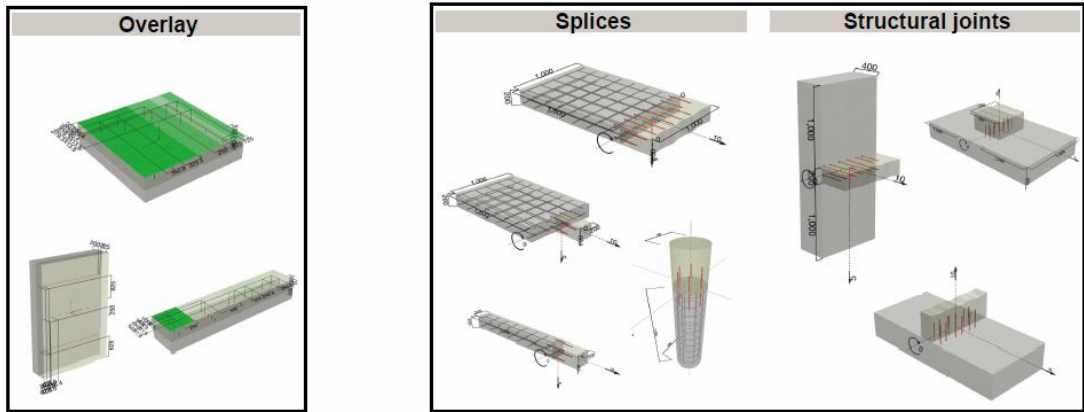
CAD-elements for overlapping, splicing, structural connections
